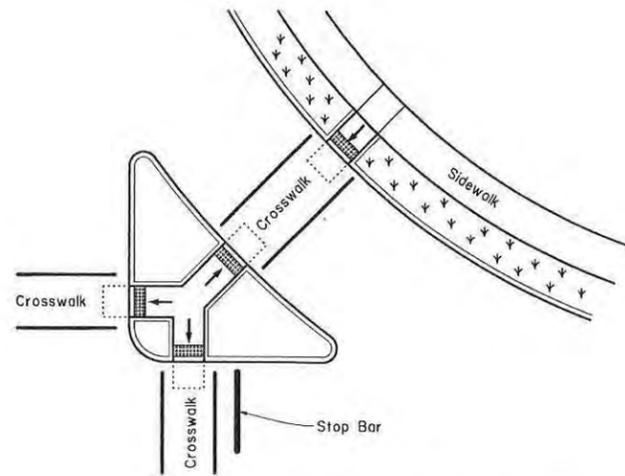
CURB RAMP PLACED OUTSIDE THE RADIUS OF A CURVE
